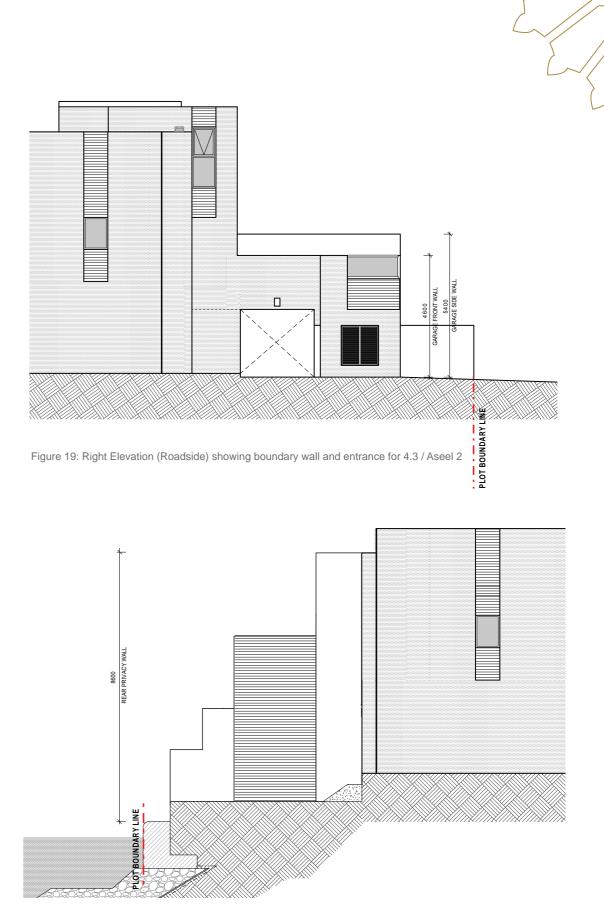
Right Elevation (Canal side) showing boundary wall for 4.3 / Aseel 2 (*Note: Rear Privacy Wall length will vary as per plot size)
